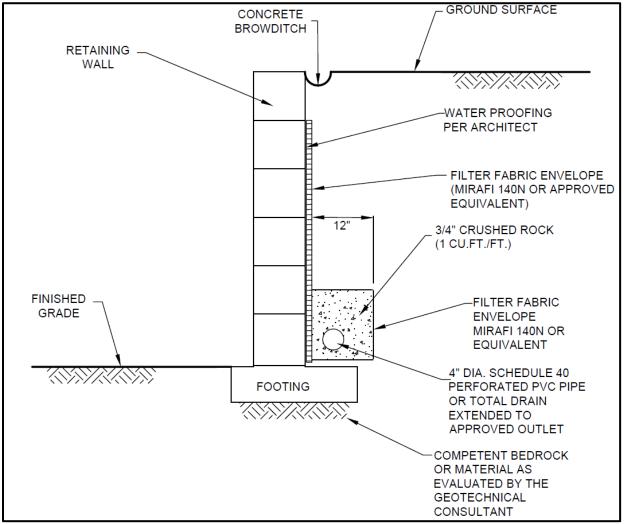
Typical Conventional Retaining Wall Backdrain Details
